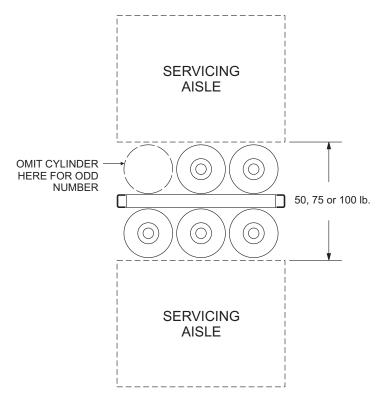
Multiple Cylinder Mounting, Arrangement B
